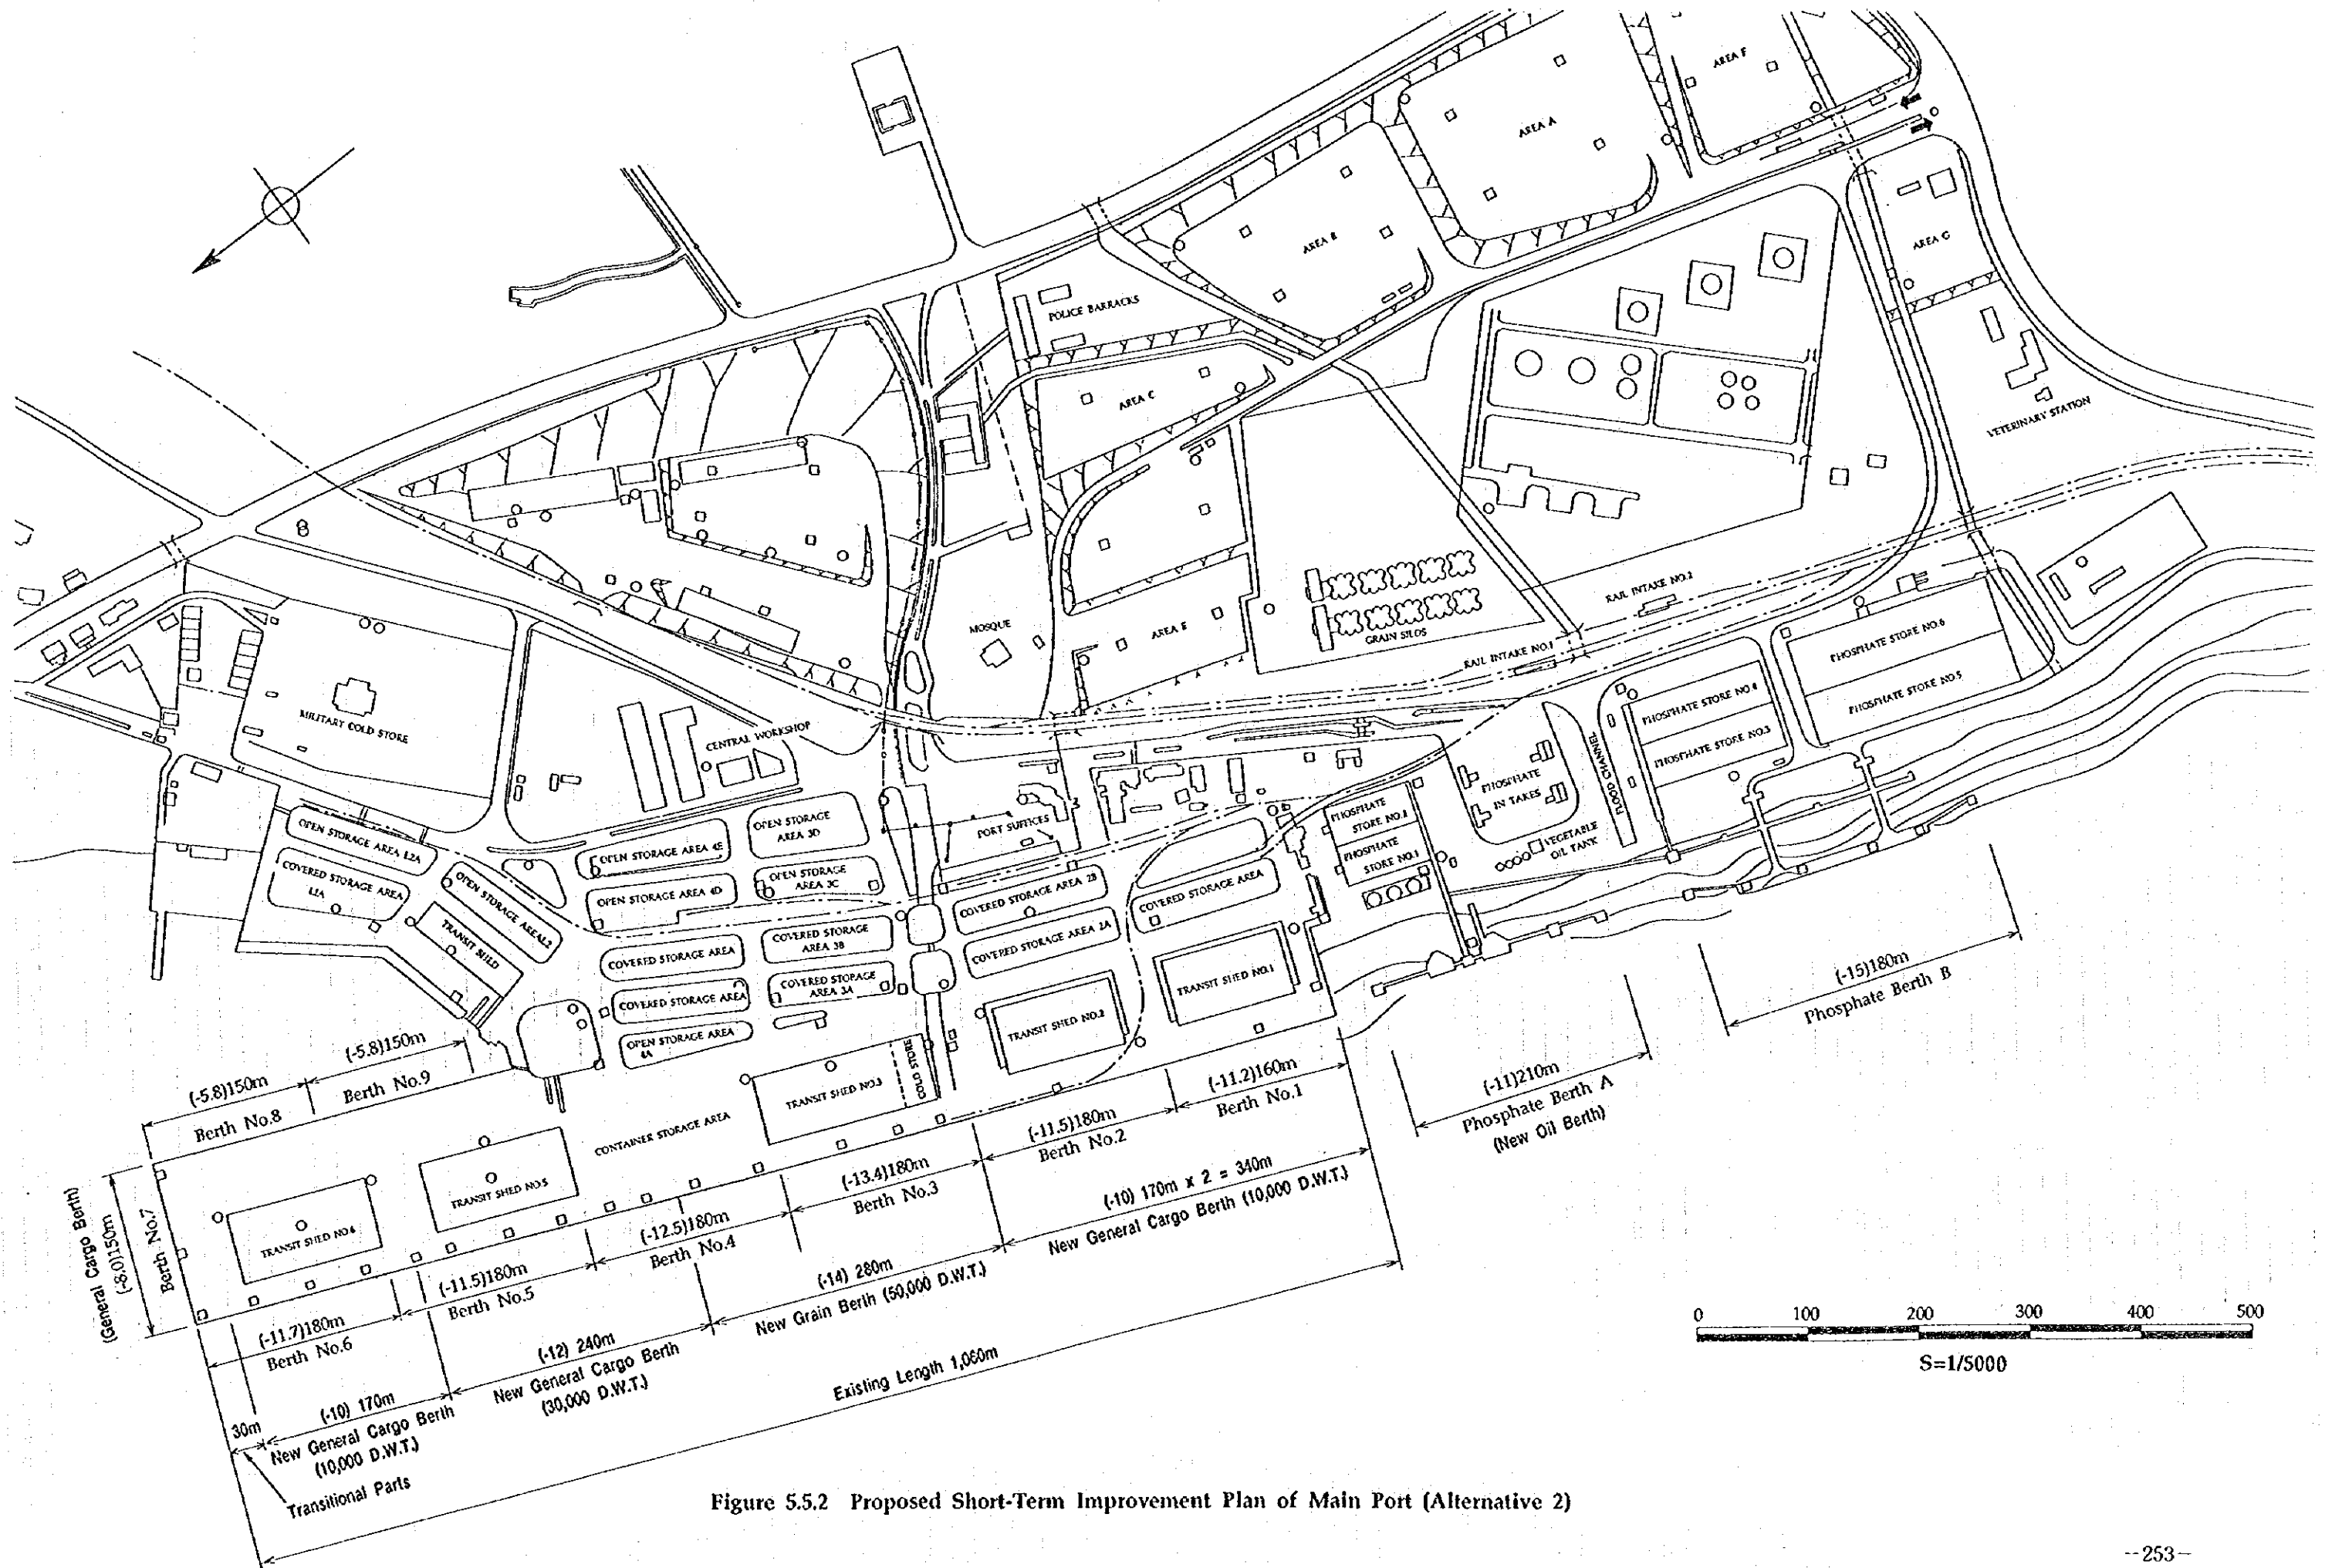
Proposed Short-Term Improvement Plan of Main Port (Alternative 2)
